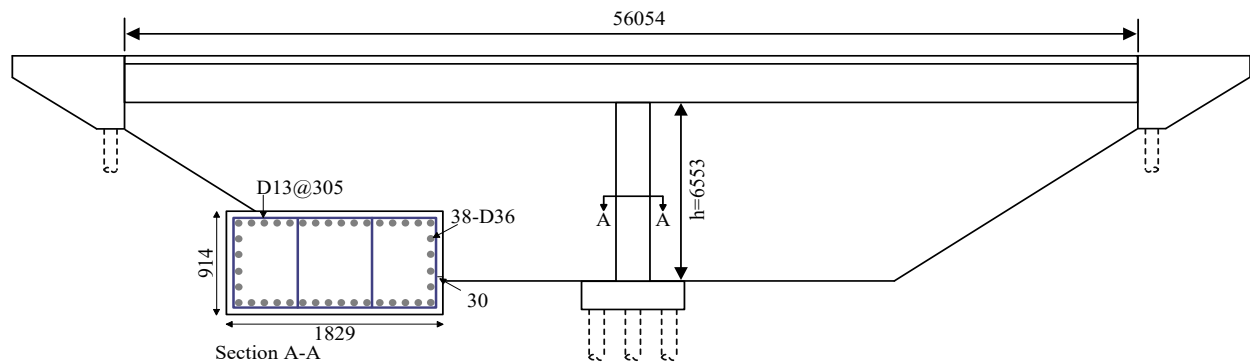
Schematic diagram of the bridge column (all dimensions are in mm).
